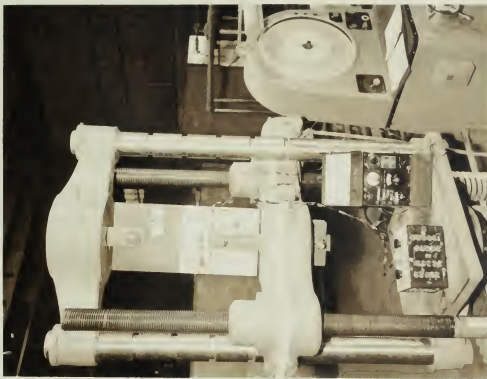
Specimen mounted in testing machine, showing load indicator dial, switch box, and strain indicator.
